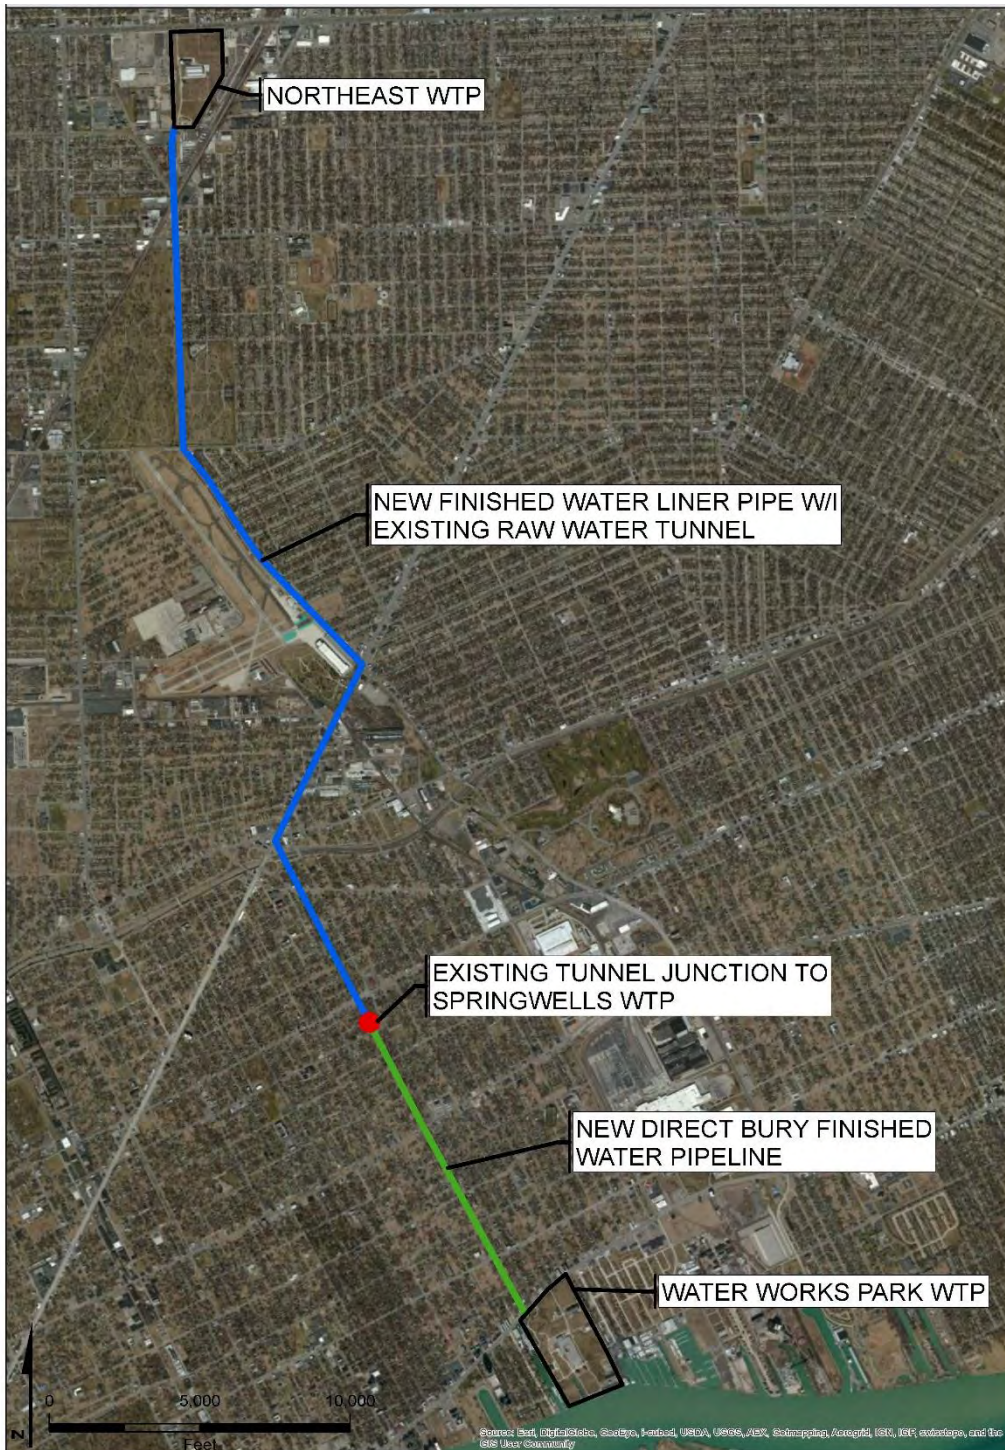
Plan View of Alternative for Re-Use of Northeast Raw Water Tunnel
